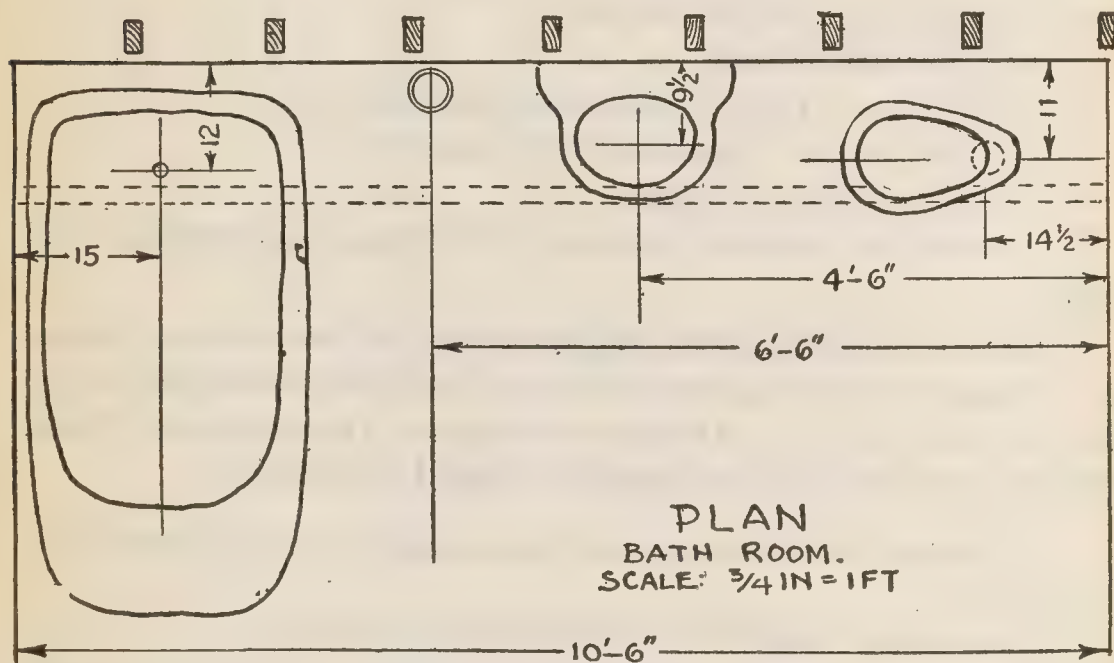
,940.—*Plan* of bath room showing location of fixtures as obtained from roughing in measurements; distances side wall to outlet centers. The reader should understand the difference between a *plan* and an *elevation*.
